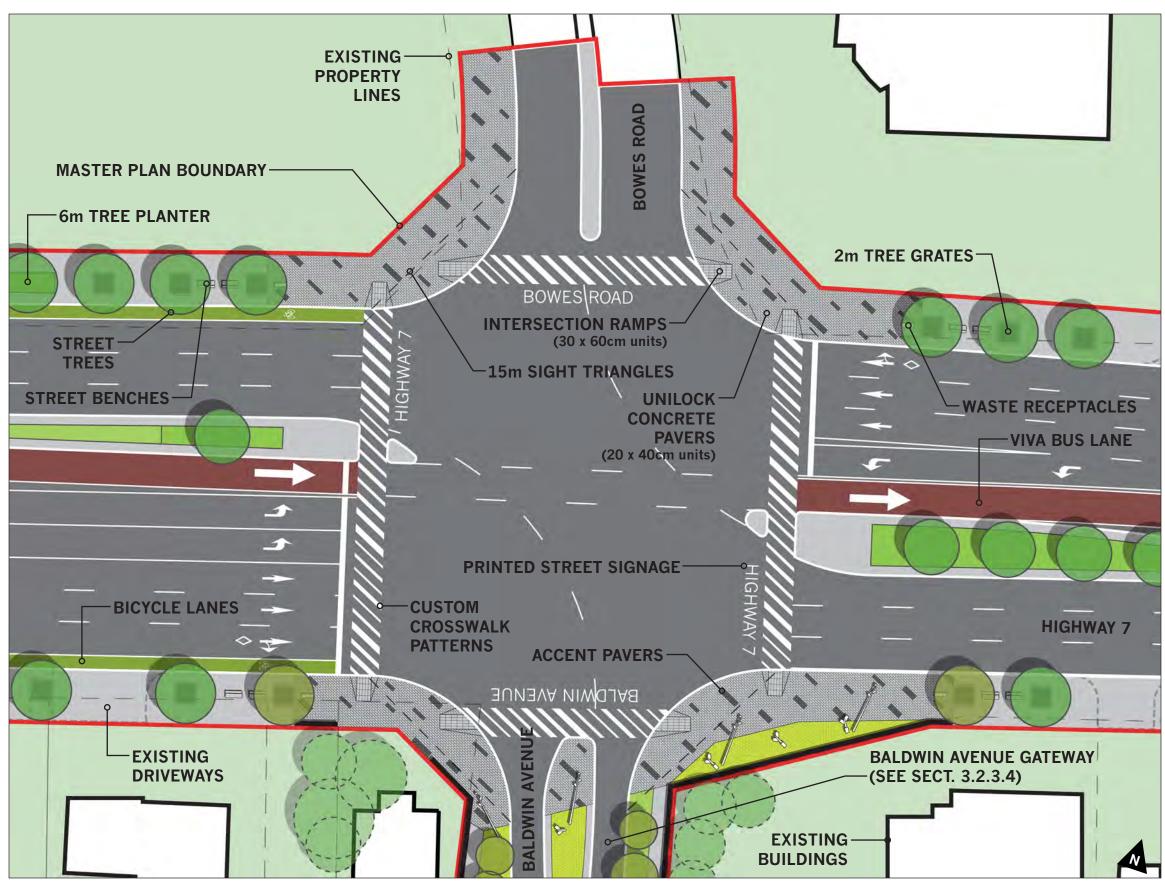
Highway 7 & Baldwin Avenue Intersection streetscape concept.
